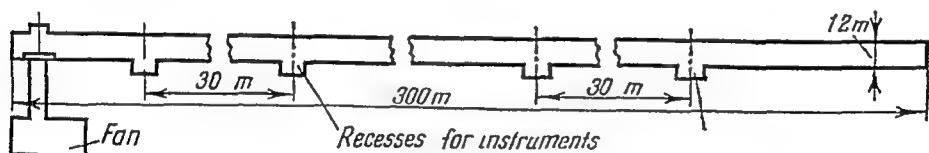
Layout of test tunnel for determining the explosibility of mine dust
